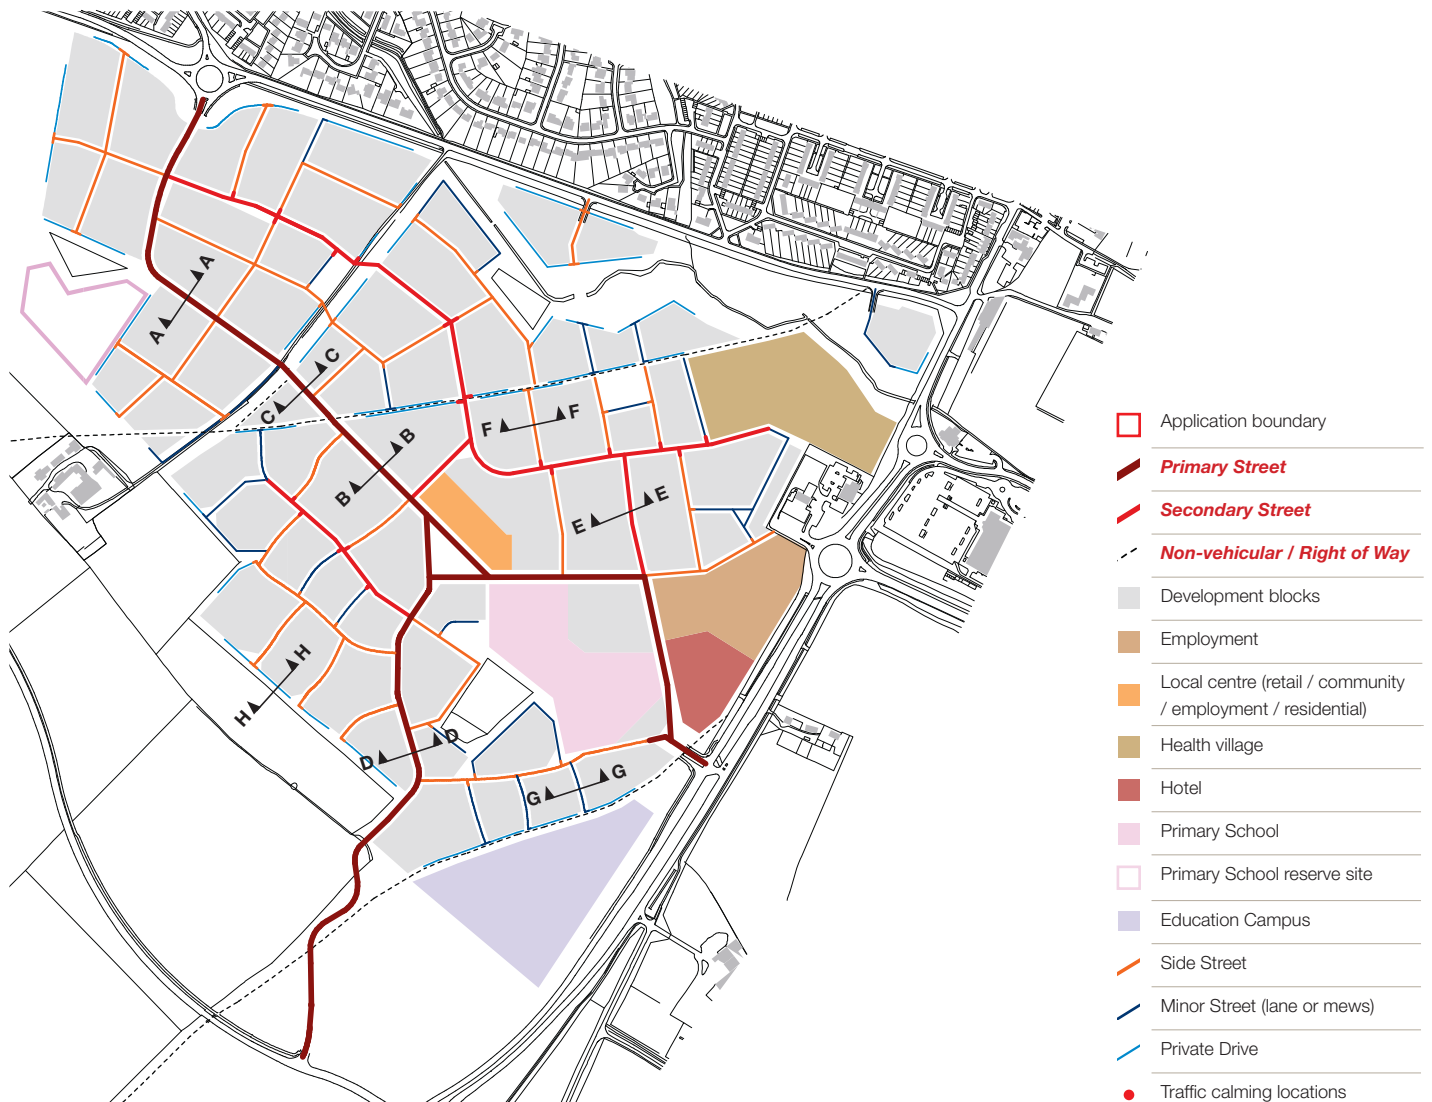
Street hierarchy plan – primary and secondary alignments only are mandatory (New perimeter road and main access junctions are shown built). Section lines refer to pages 54 and 55.
